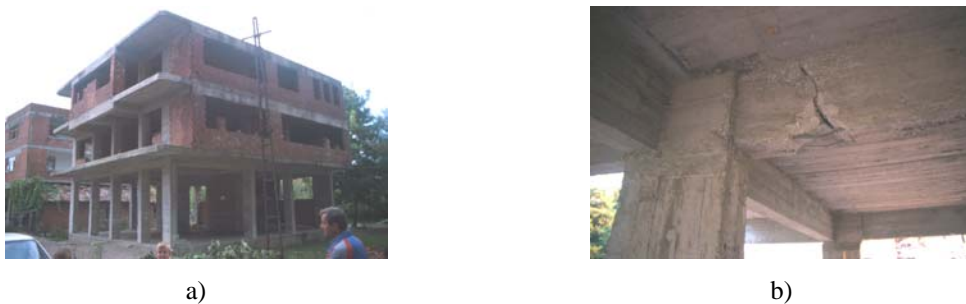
Typical buildings in Turkey (Aschheim, 2001): a) view; b) typical beam details
